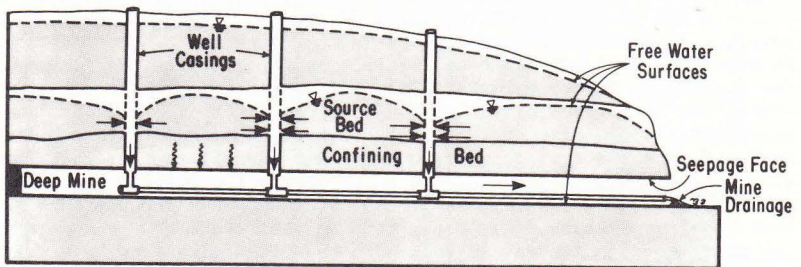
Gravity drainage wells used to dewater source beds above a deep mine. Wells are drilled from land surface and cased above the source beds. Water is piped from the mine to prevent contact with wall rock. (From R. R. Parizek, 1971)
